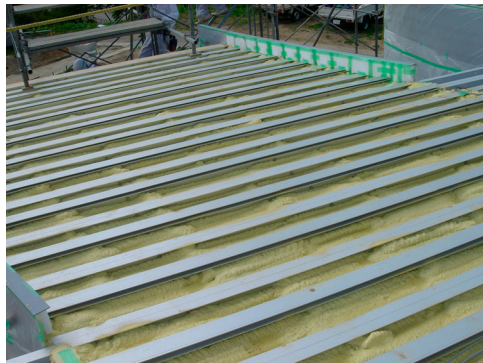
An interior layer of wall insulation addressed thermal bridging (© Toda Kensetsu).
